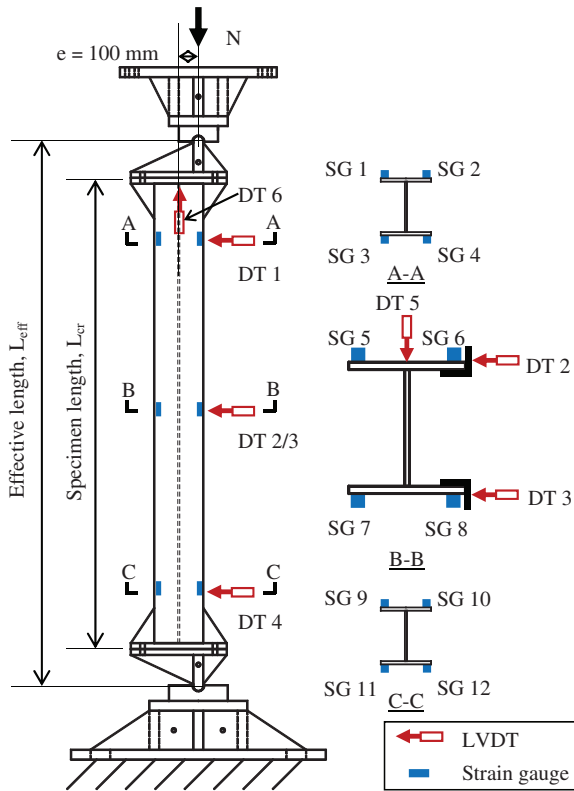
Test setup for welded H-sections under eccentric loads.
